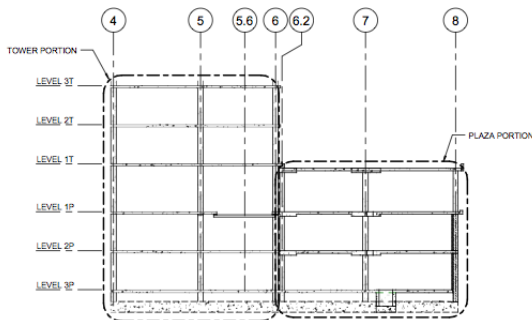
Elevation showing location of expansion joint and relationship between the Plaza portion and Tower Portion
